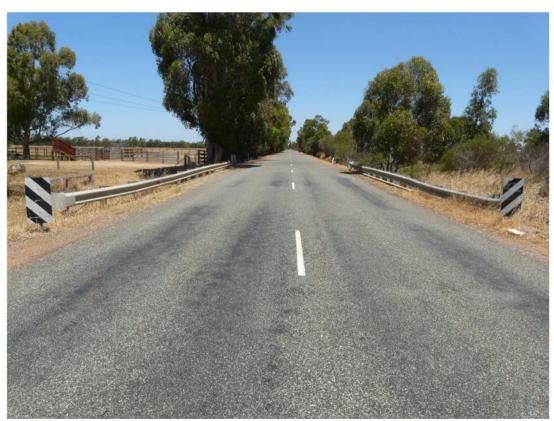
Abutment 2 end, looking south (Taken: 14-Mar-2010)
